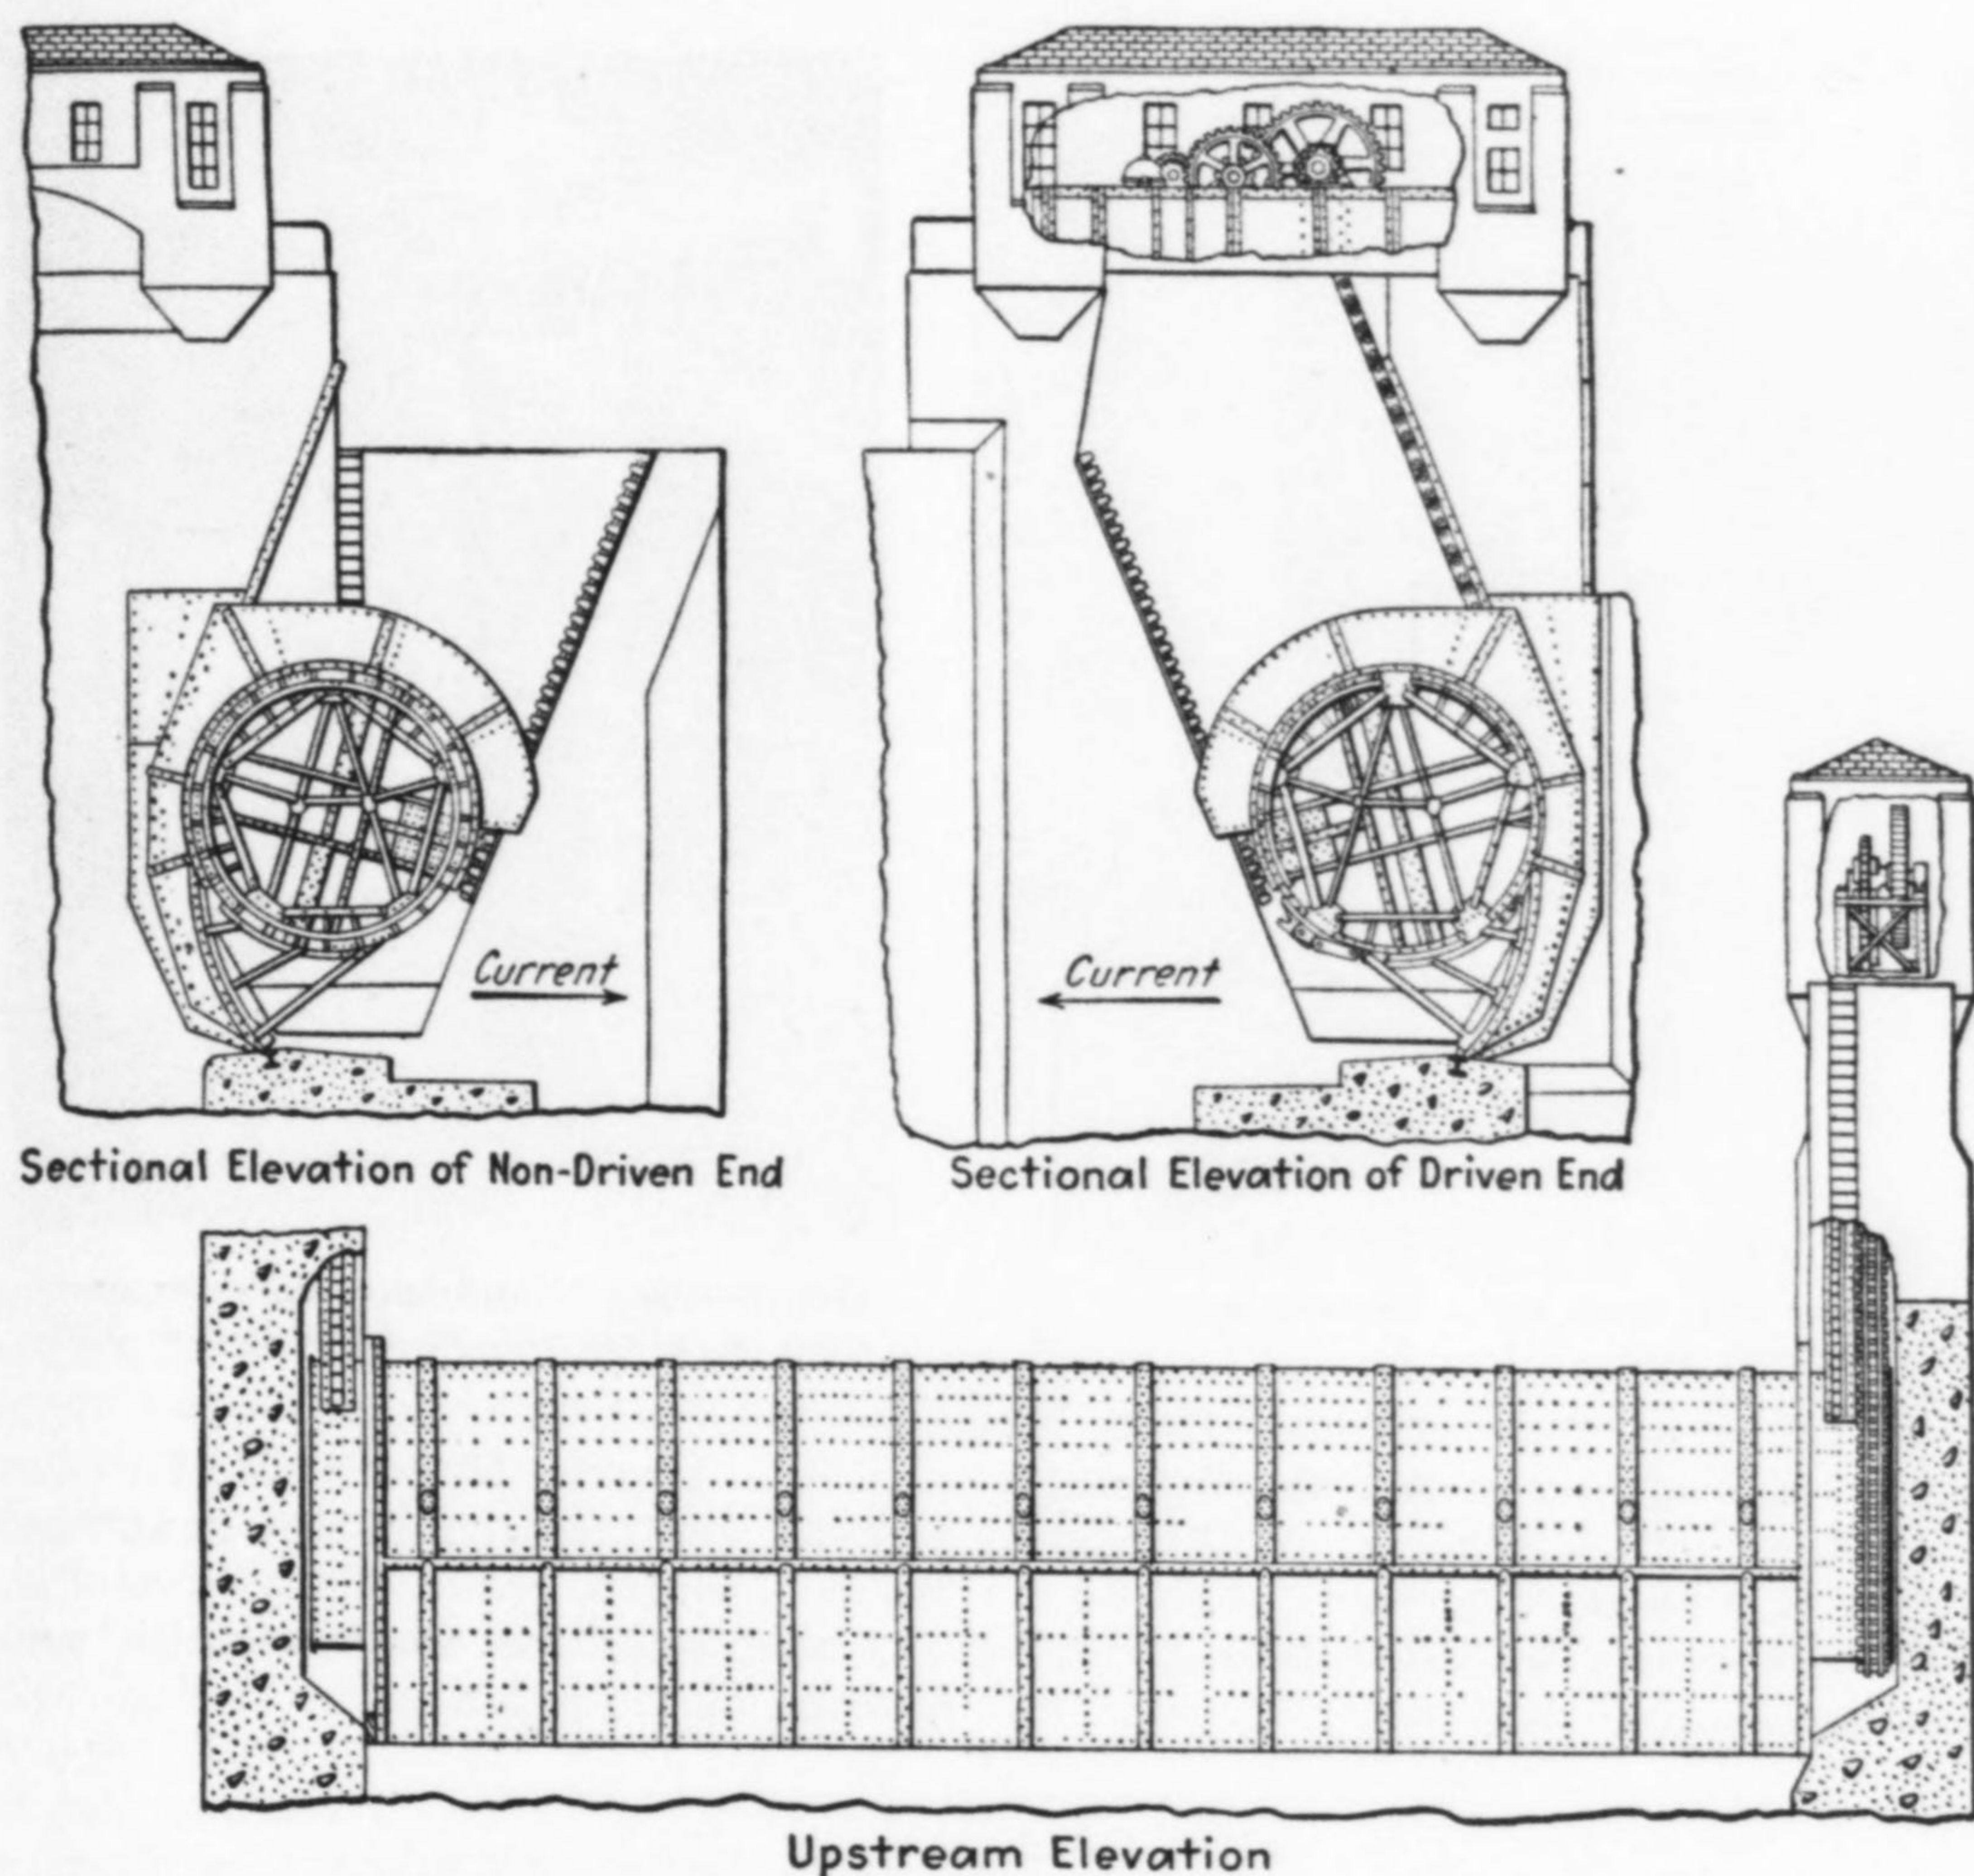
ROLLER-GATE ASSEMBLY, indicating gate structure and operating machinery
